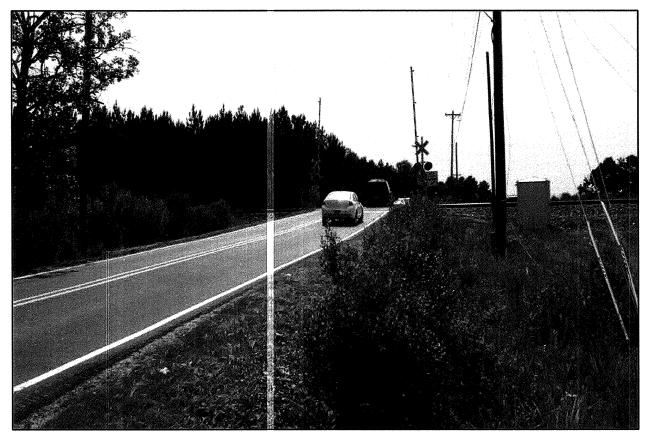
LOOKING WEST ALONG HOPSON ROAD AT EXISTING AT-GRADE CROSSING. PHOTO TAKEN FROM NEAR PROPOSED GRADE SEPARATION LOCATION EAST OF EXISTING TRACKS.
